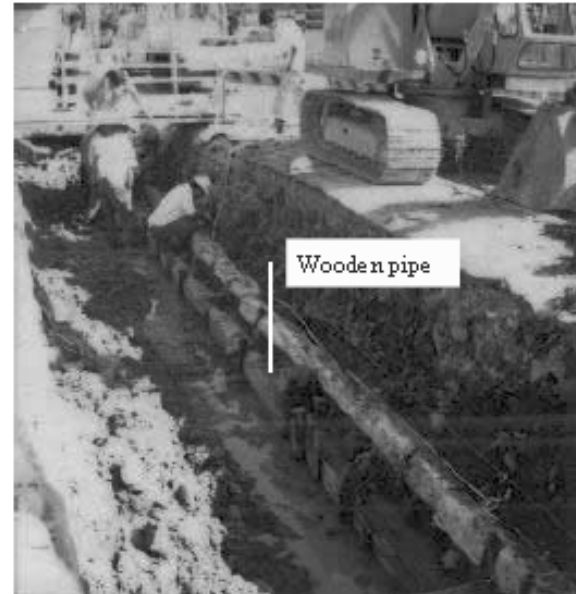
Buried wooden pipes at a construction site (photo by M. Azechi, 1981)
